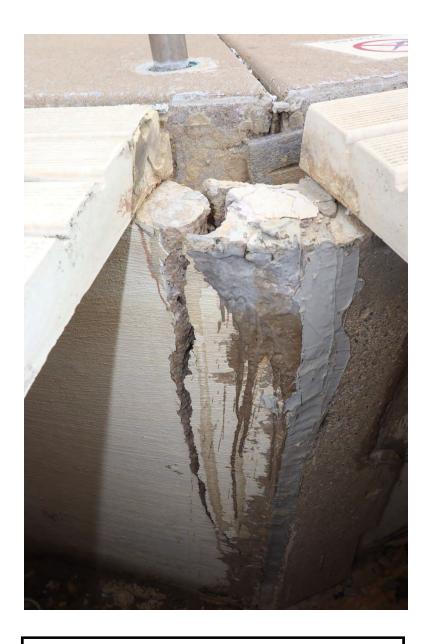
View illustrating cracking at south wall transition corner—outer wall
